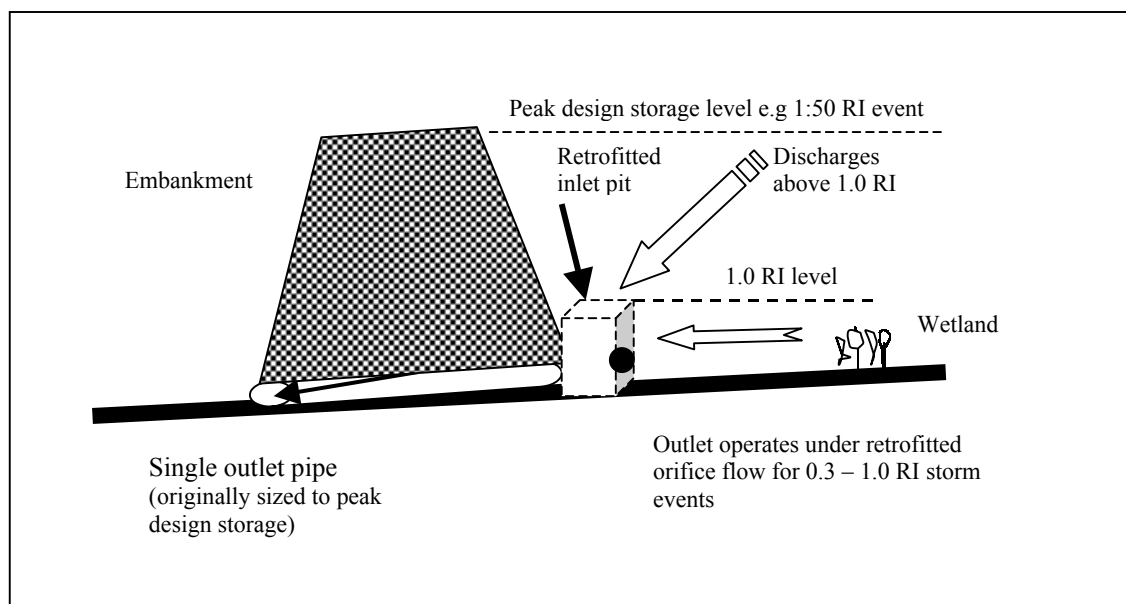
Retrofitting a Dual Outlet to Flood Storage Pond
